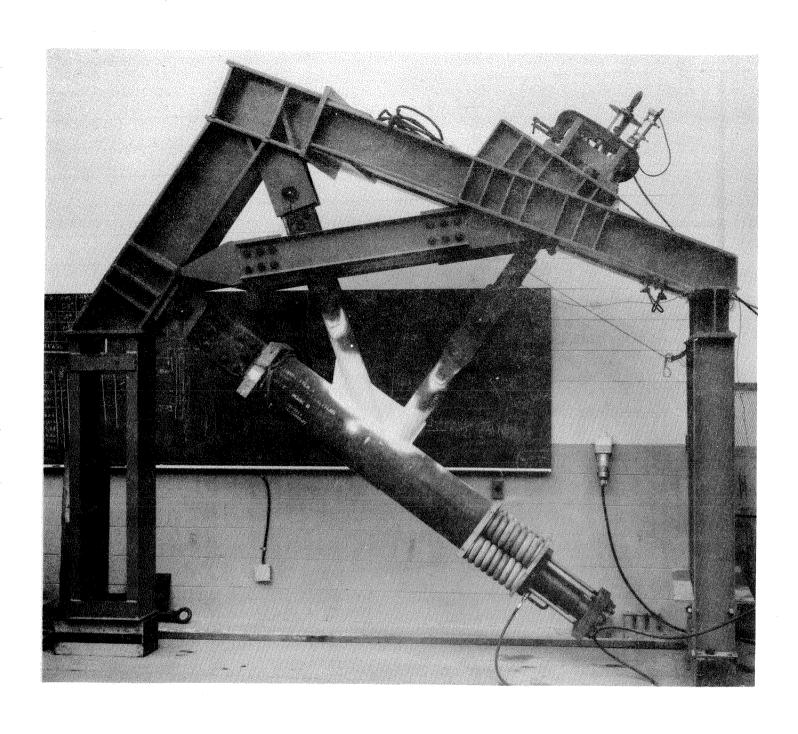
TEST FRAME WITH MOUNTED SPECIMEN
